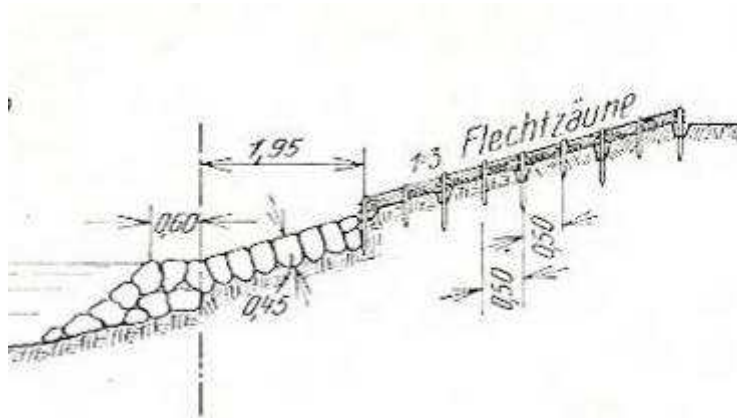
Examples of suggestions from a professional publication Schoklitsch, A. Der Wasserbau (Springer WIEN 1930) [9]
